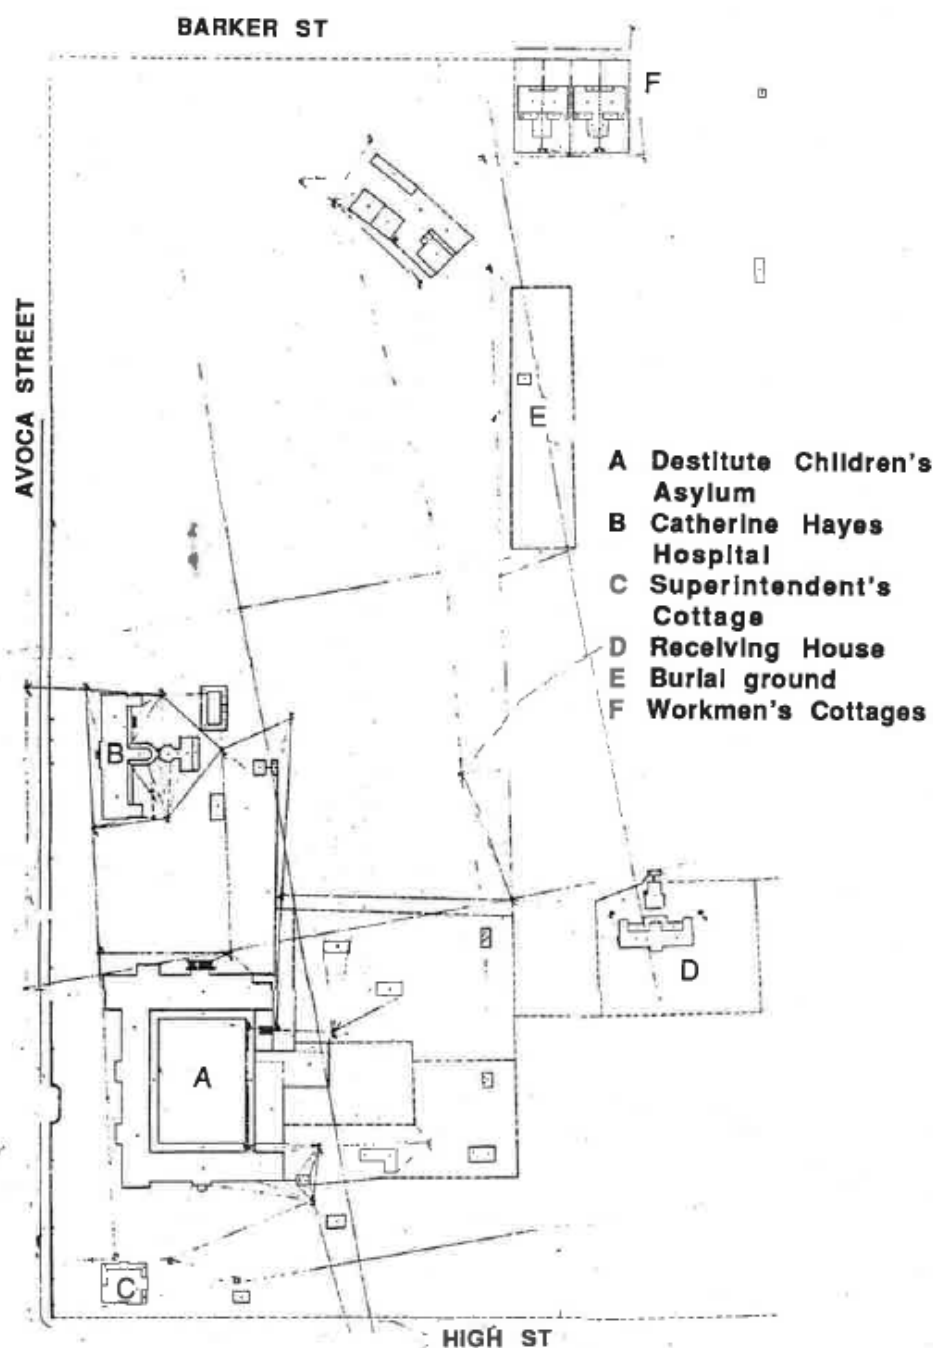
Plan showing the location of original buildings, circa 1893 (Source: Doyle & Storey, 1991).
